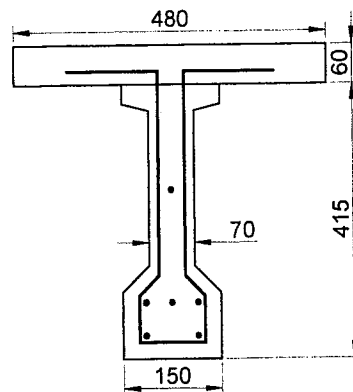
Prestressed I-Shaped Beams with Bent-Legged Stirrup Tested in Manitoba (HUTCHINSON, 1999)
